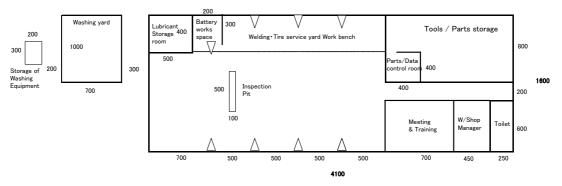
Proposed Layout Plan of the Maintenance Workshop at the Dang Kor Disposal Site
